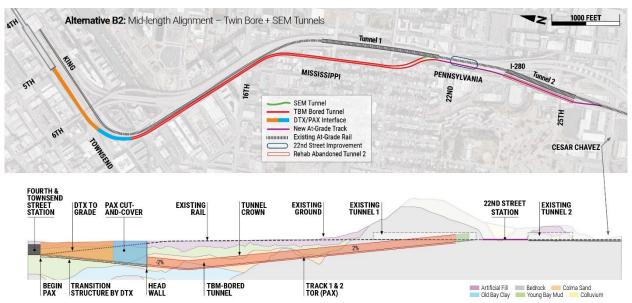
Mid-Length Alignment – Twin Bore + SEM Tunnels. Rail and Existing Caltrain Tunnels Noted. See Appendix B.
